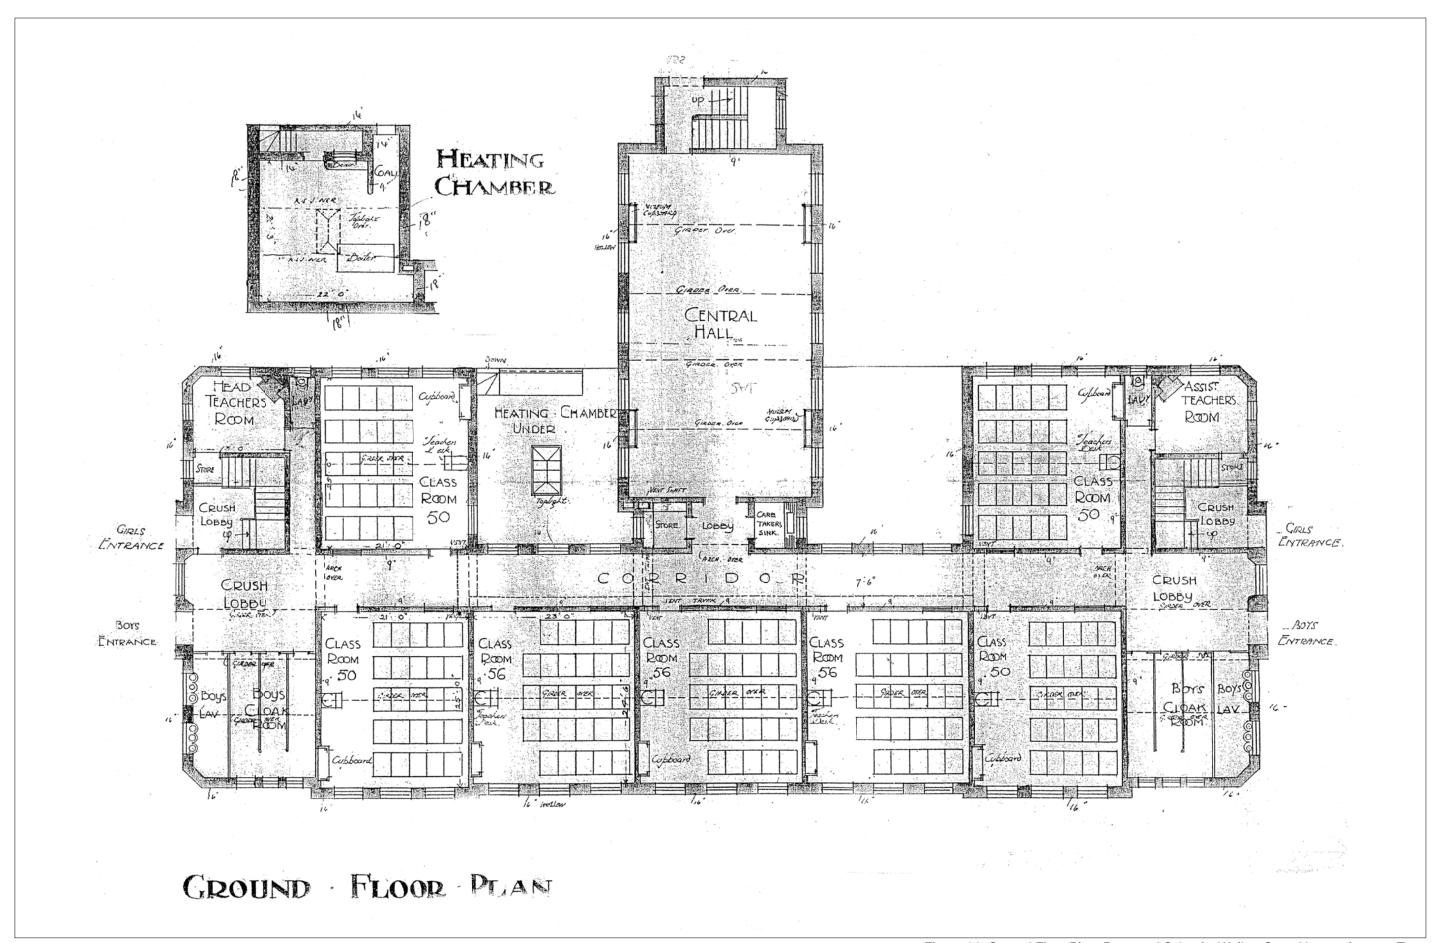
Ground Floor Plan. Proposed Schools, Walker Gate, Newcastle-upon-Tyne March 1912, Marshall and Tweedy Architects for the Newcastle-upon-Tyne Education Committee Original scale: 8 feet to 1 inch
